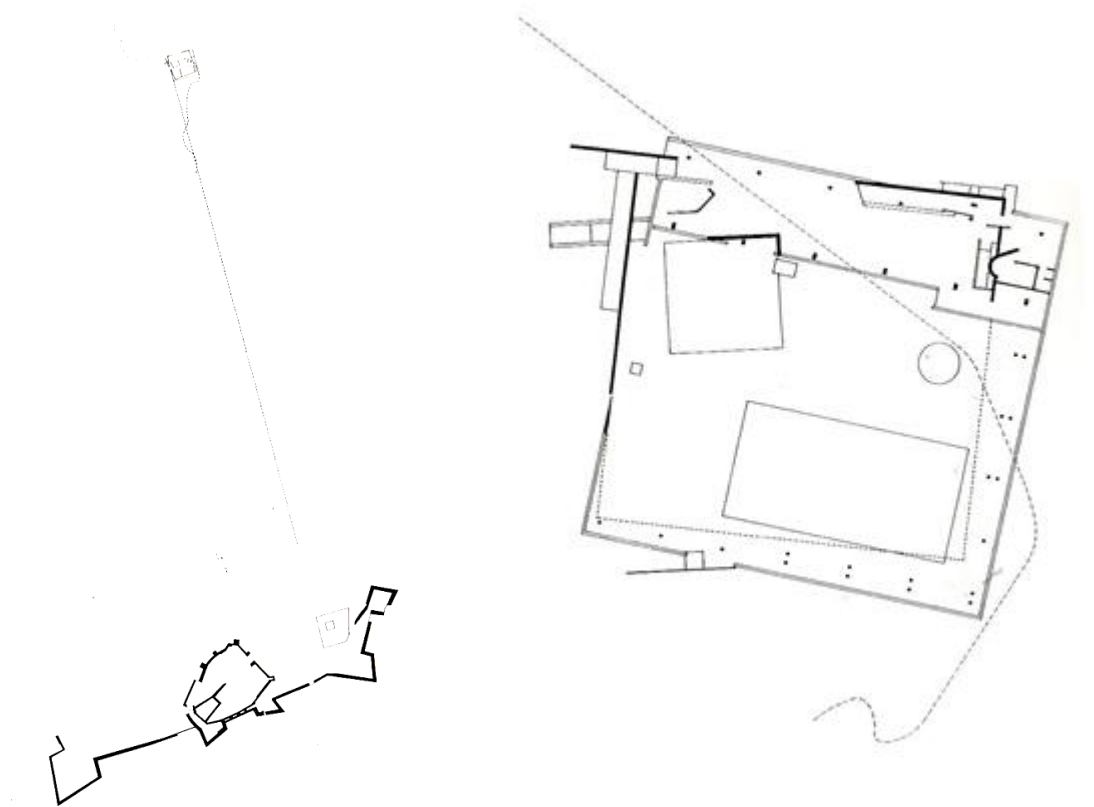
Campo Maior Swimming Pools, J. L. Carrilho da Graça – site plans and concept drawings.
